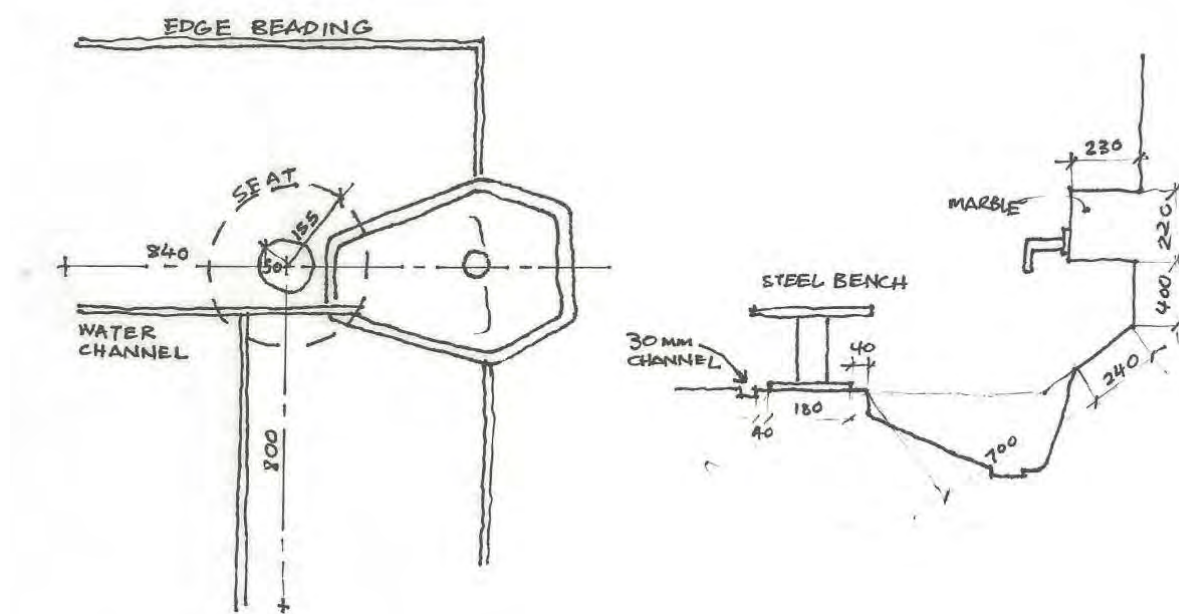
, Plan and section of a single ablution tap with seat and shelf (Author, 2011)
